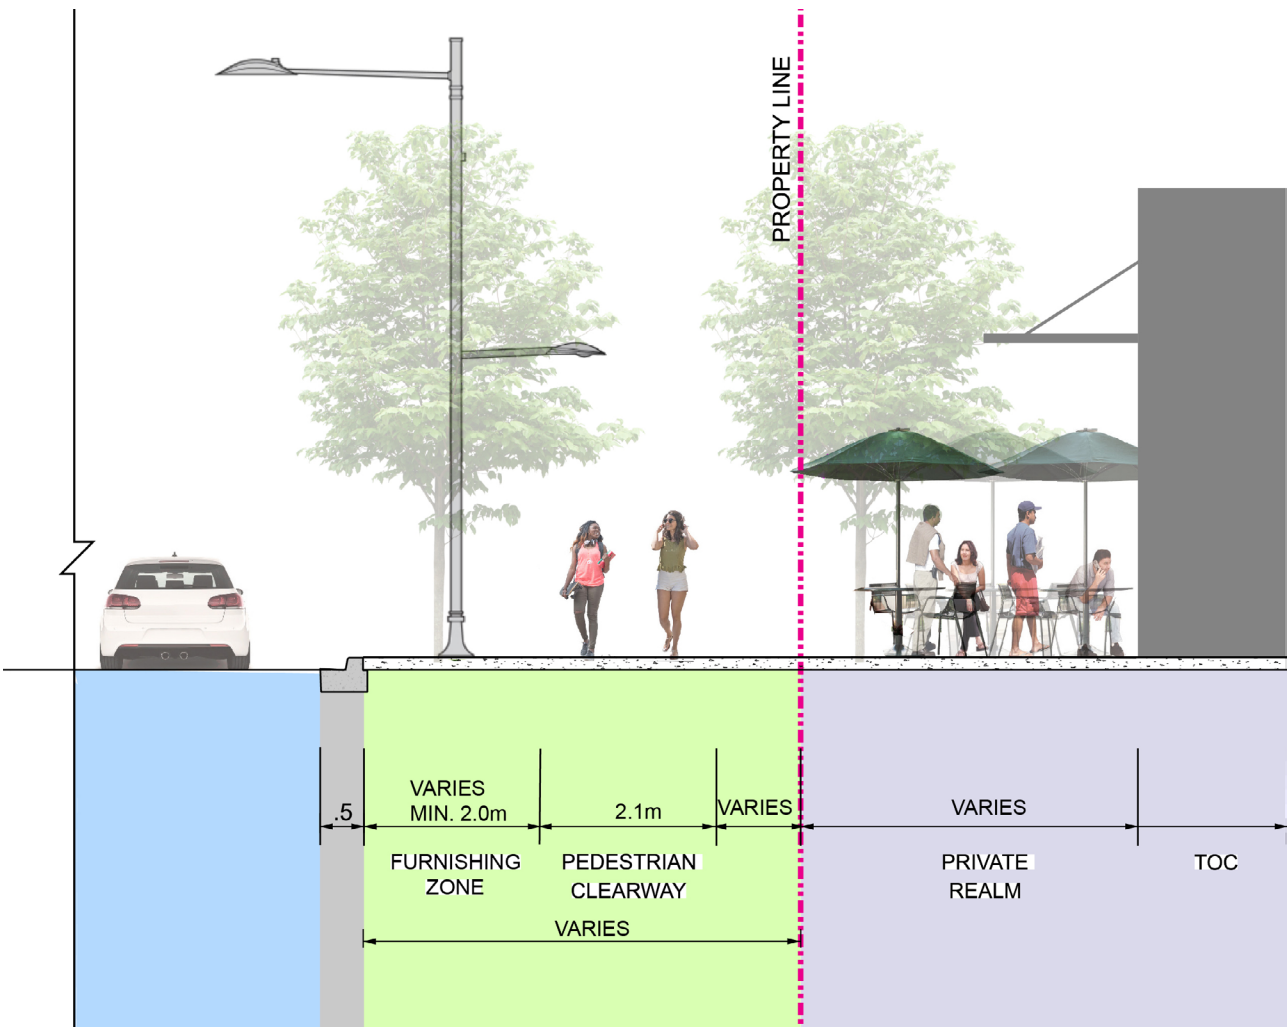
McCowan Road TOC Streetscape Section- Looking North
